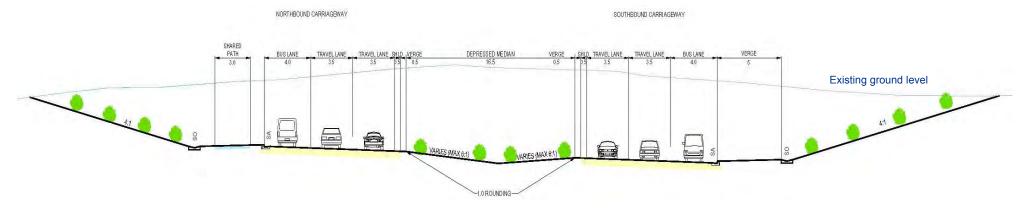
Indicative cross section and elevation of the proposed cut, about 500 m north of Vicar Park Lane (about chainage 3500)
